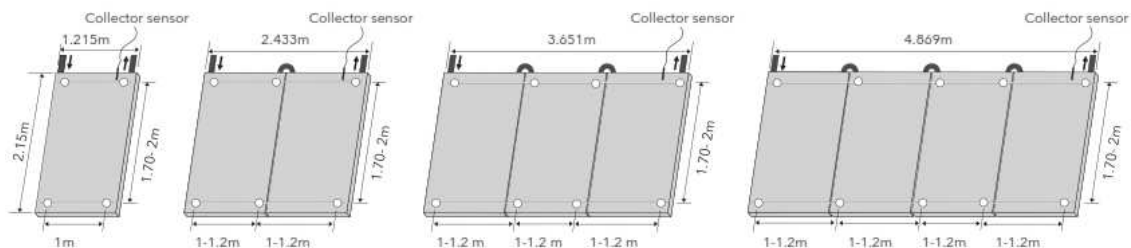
Vertical collector arrangement: Up to 4 EURO C20 in serial connection. The mounting rails run horizontally. More than 4 EUROs are combined from serial and parallel connections.
